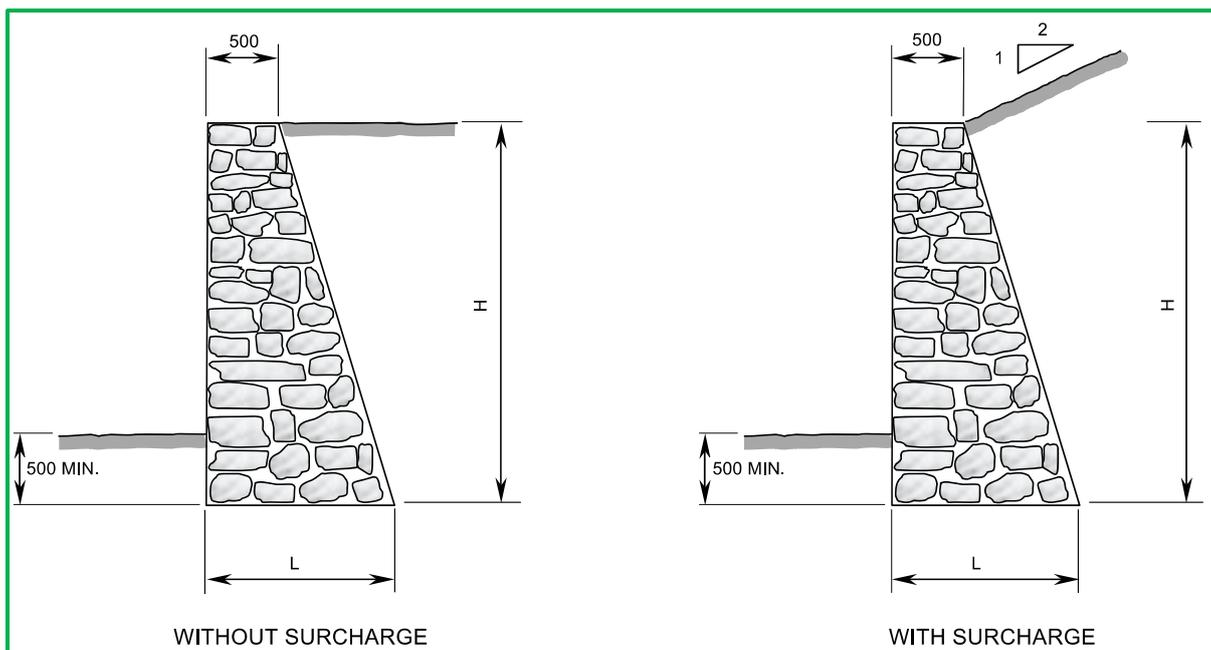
Stone, brick or blockwork wall with and without sloping backfill (surcharge)
